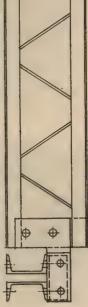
Mac-Mar Junior Trusses are optional for floor joists.
